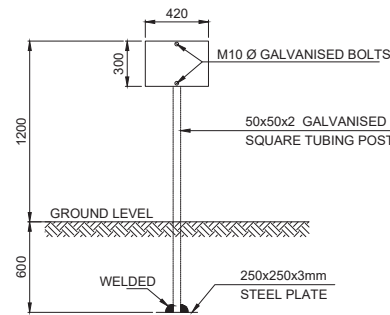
SIGN POSITIONING-LOW FILL / SHALLOW CUT
